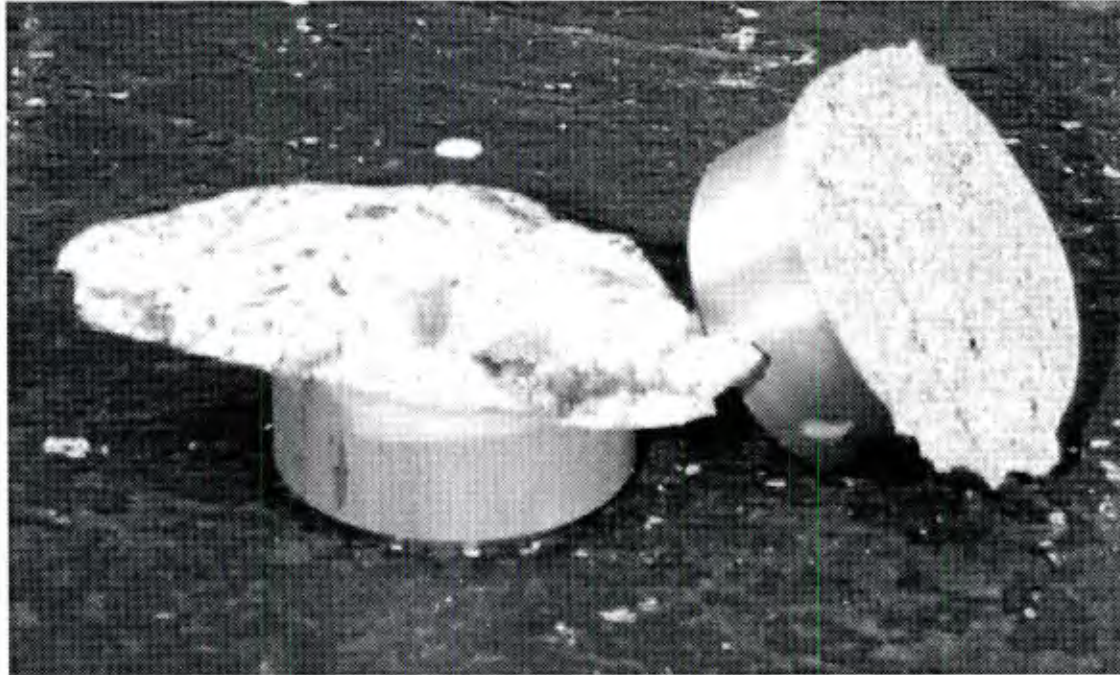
Pull-off test "pucks". Primed concrete surface on left puck shows penetration into microcracks. Unprimed concrete surface on right puck.
